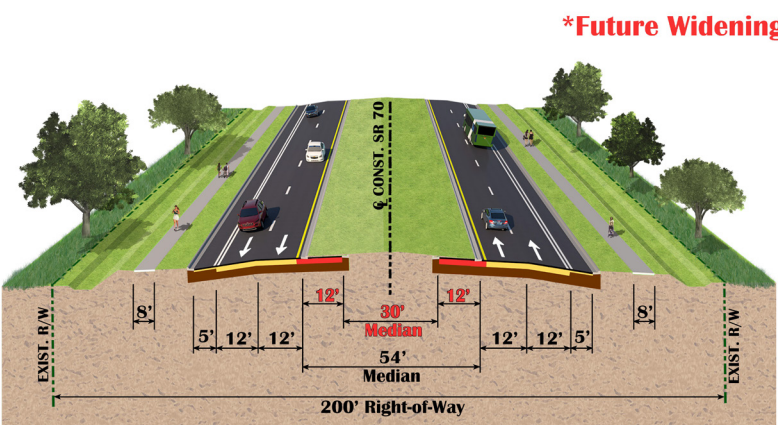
East of Greenbrook Boulevard to Bourneside Boulevard
